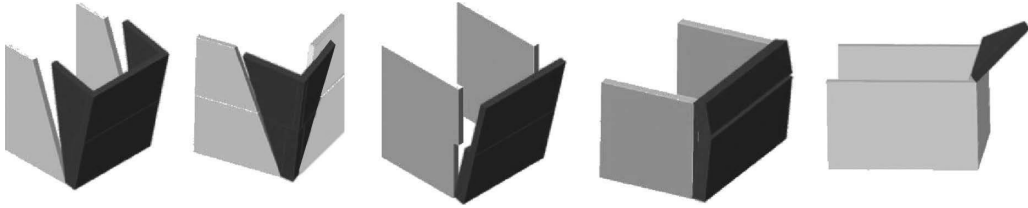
Typical out-of-plane failure mechanisms for unreinforced masonry structures.
